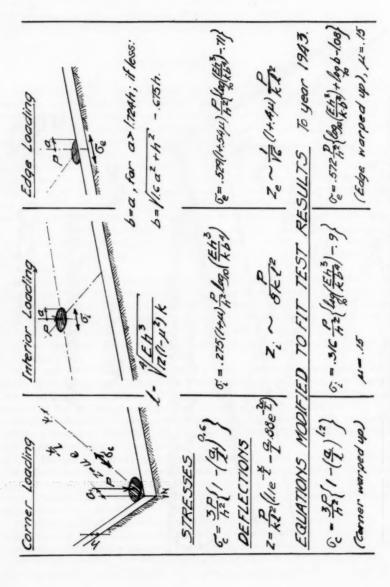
Westerguard pavement stress equations, with modifications suggested by stress observations on warped slabs.
